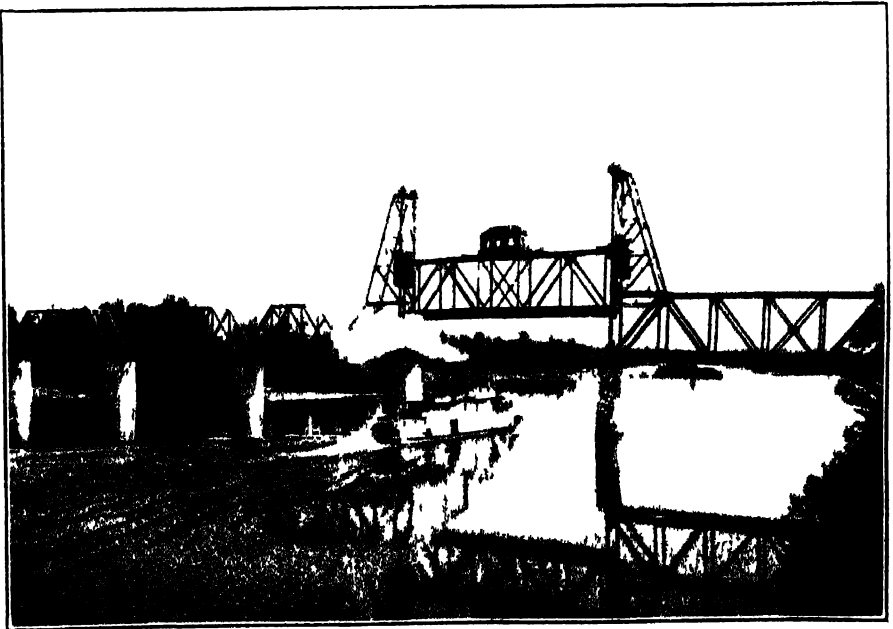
Salem, Falls City, and Western Railway Bridge over the Willamette River at Salem, Oregon.—Lifting Span Up.
